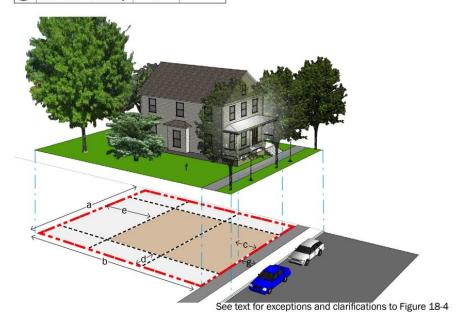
Lots That Do Not Front on Main Street or East Main Street
